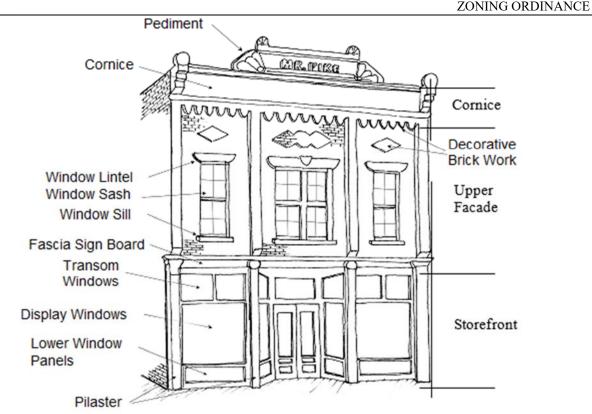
TYPICAL FEATURES OF COMMERCIAL STRUCTURES IN THE DOWNTOWN HISTORIC DISTRICT
